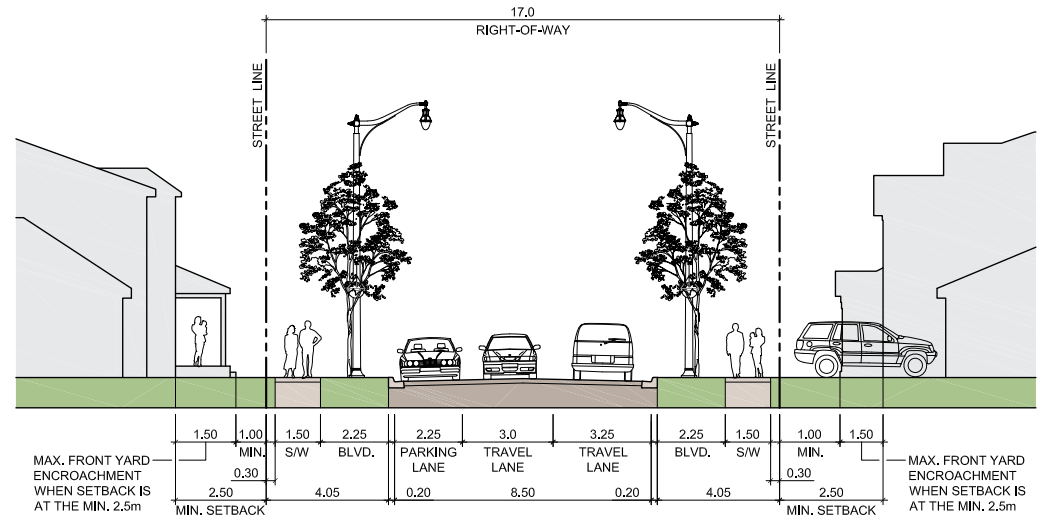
Low Density Residential / Local Road Streetscape - 17.0m R.O.W. / 2 travel lanes / on-street parking on one side / 4.05m boulevard.
